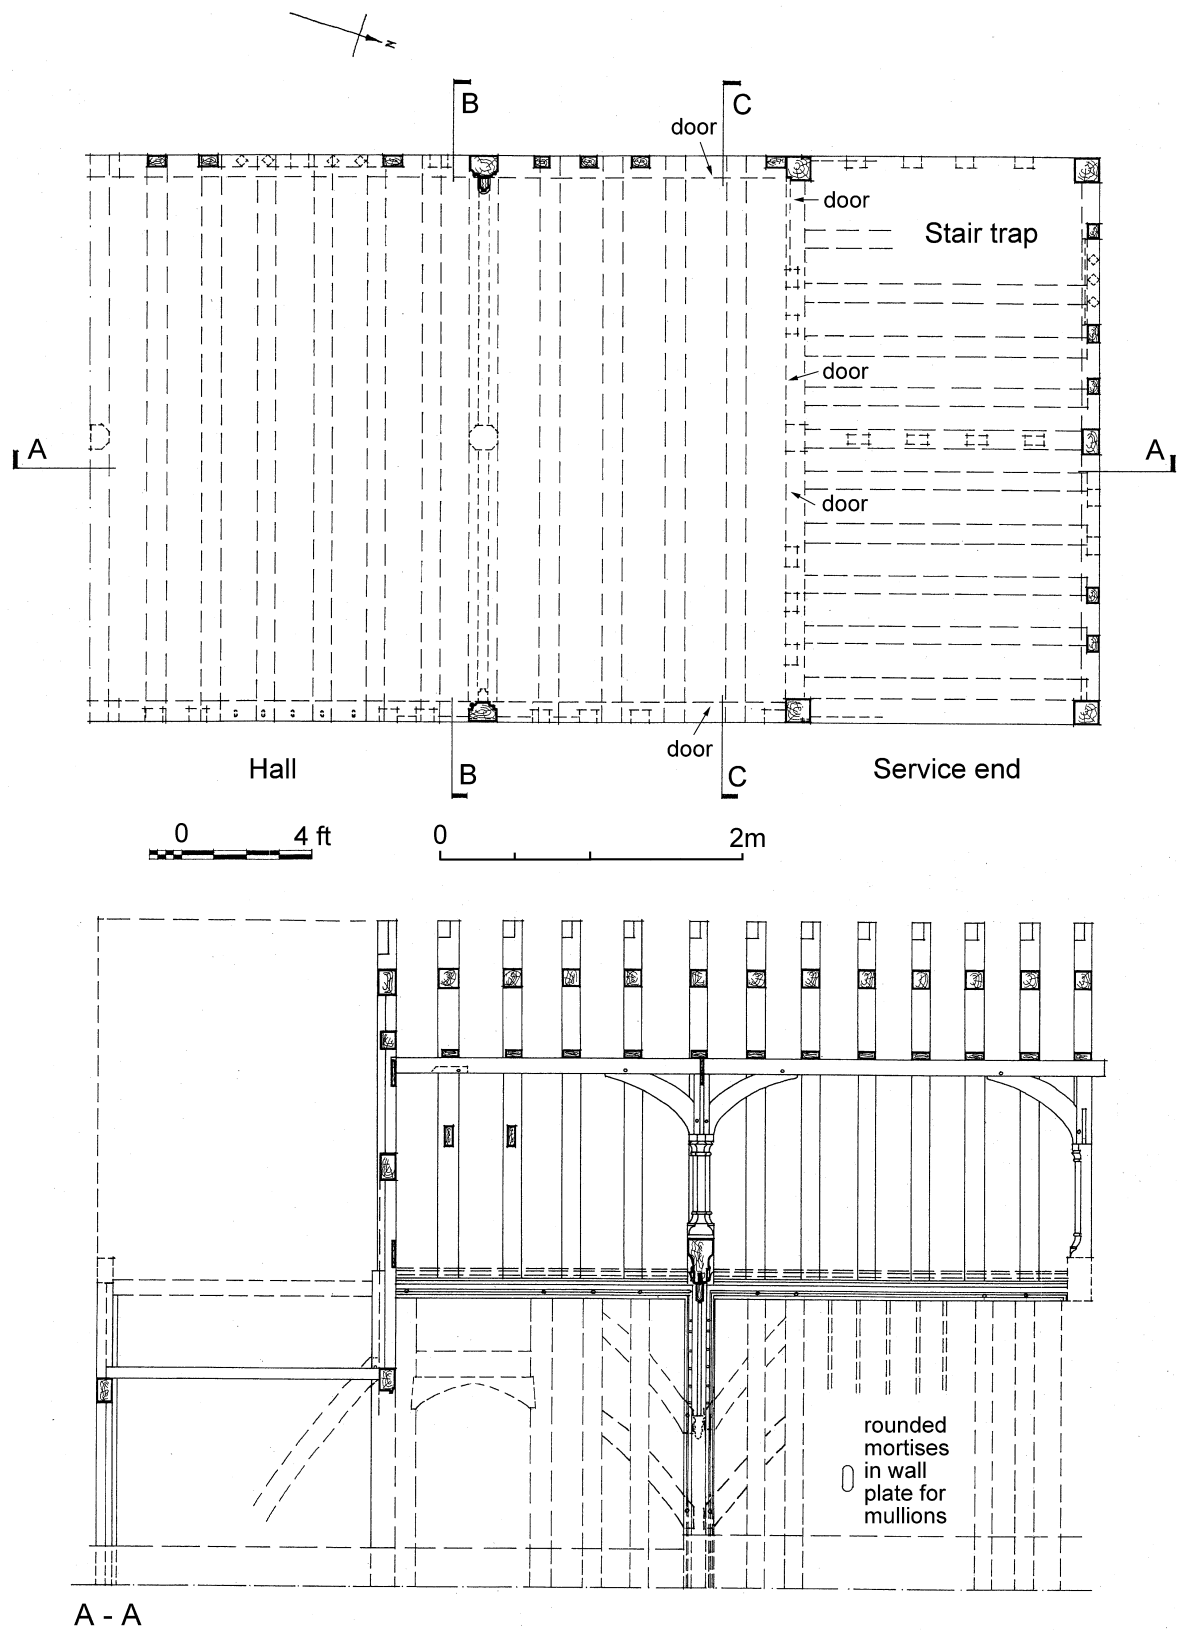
Fobbing, Copeland House, plan and long section, front (east) wall seen from the inside.
